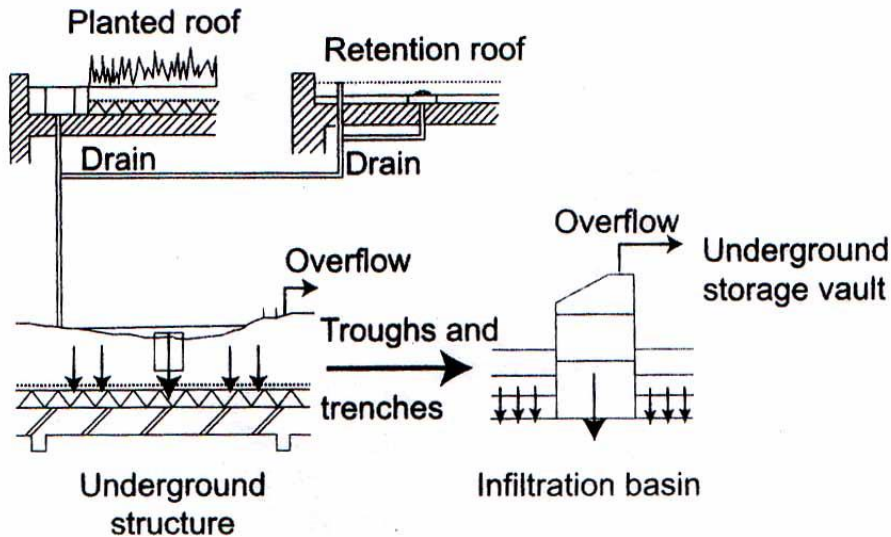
Rainwater Harvesting System for Flat Roof in Modern Building (Source: Author)
